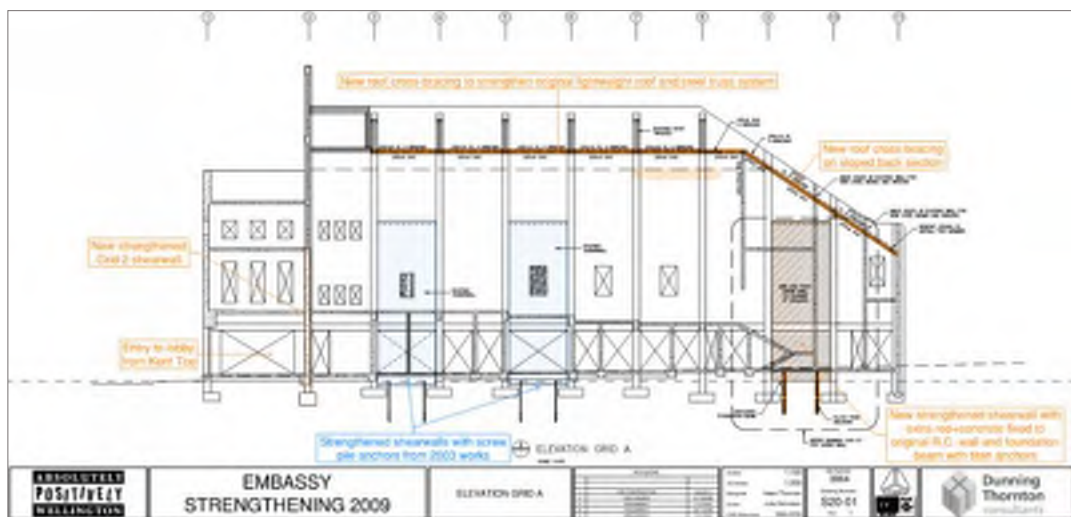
Longitudinal section from 2009 structural drawings showing strengthening to steel roof structure and adding to concrete shear walls on Grid A and Grid 2.
